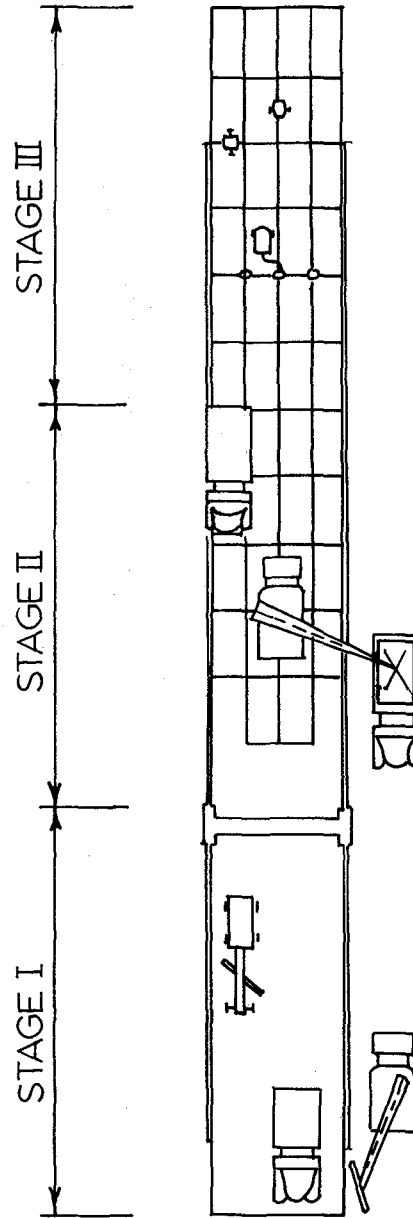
DOWELED SLABS LAID ON ISOLATED ANGULAR FOOTINGS
